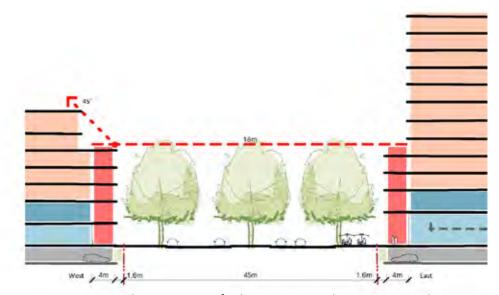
Typical cross section of John Gorton Drive (town centre core)
